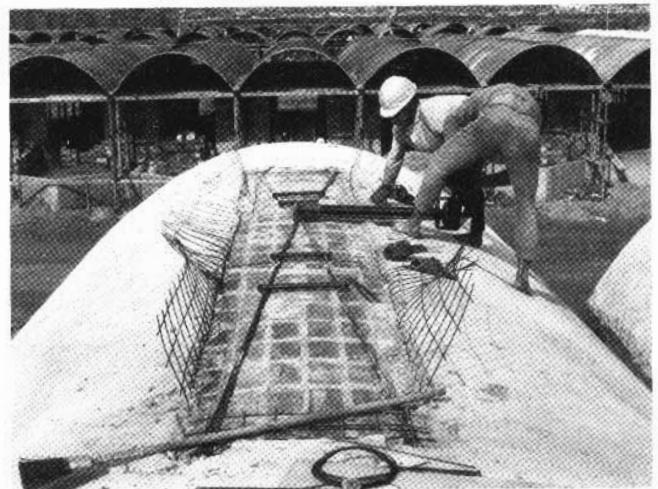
Pre-stressing the looped steel rods with a mechanical jack. The light steel welded mesh will be bent back and cemented to complete the roof.
